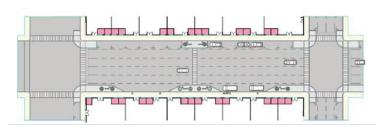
Image showing street plan where street trading is accommodated (Complete Streets Design Guideline, 2019)
